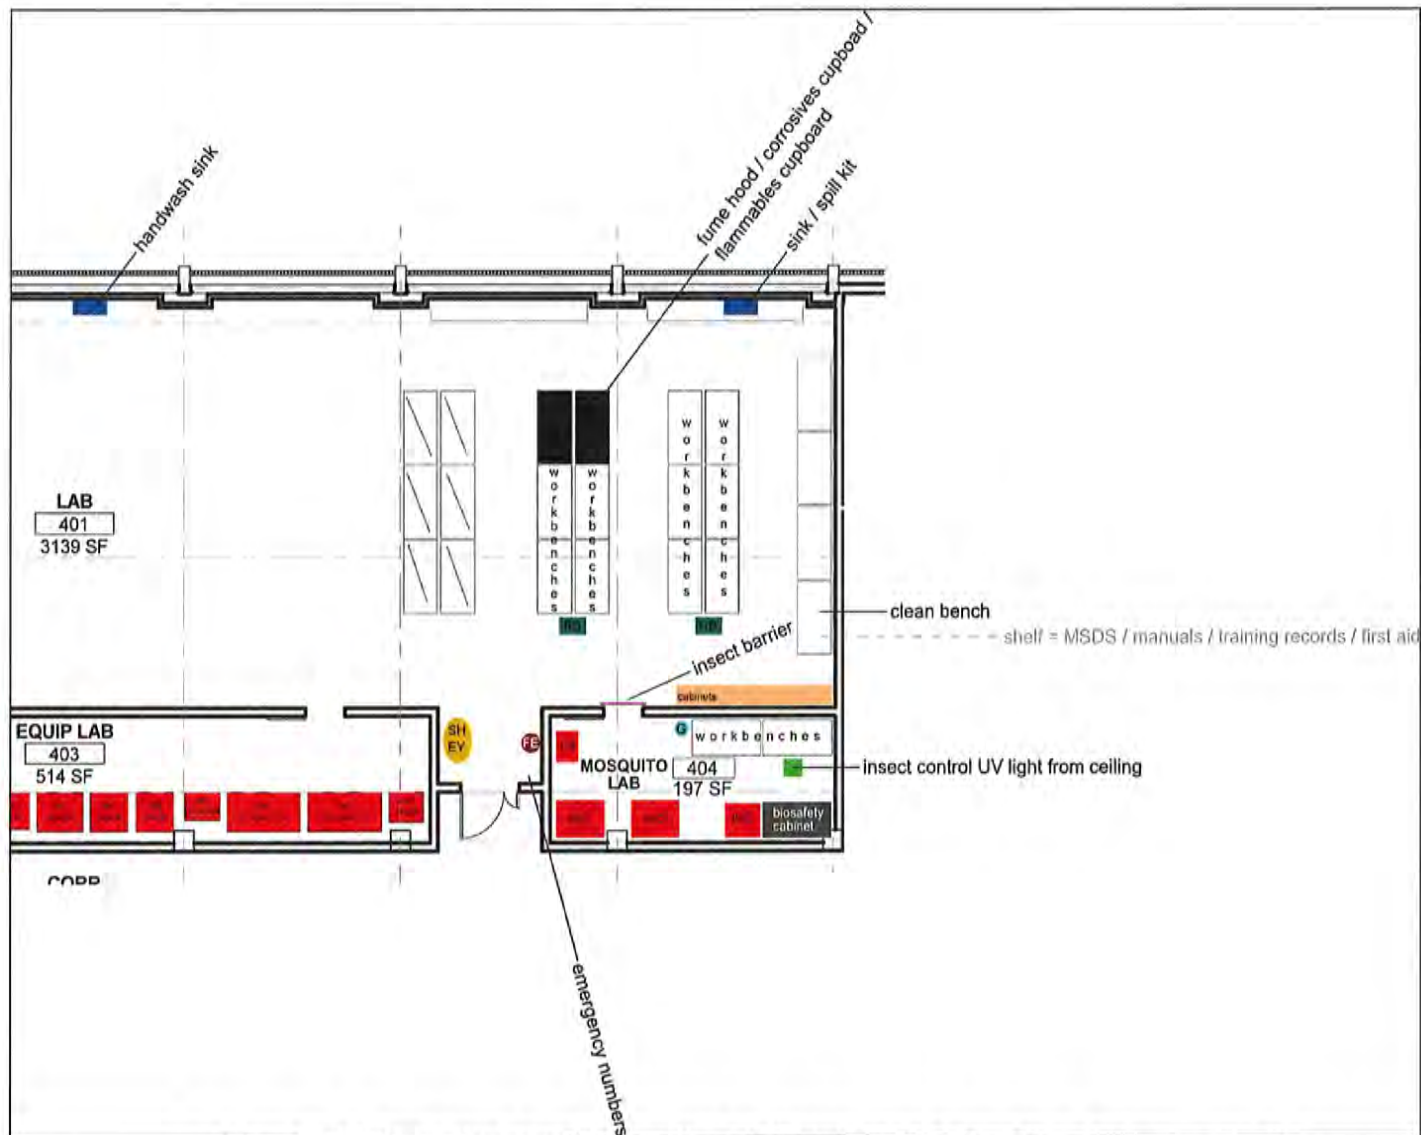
Floor plan (part B) for the UHM laboratory facilities described in this application.
